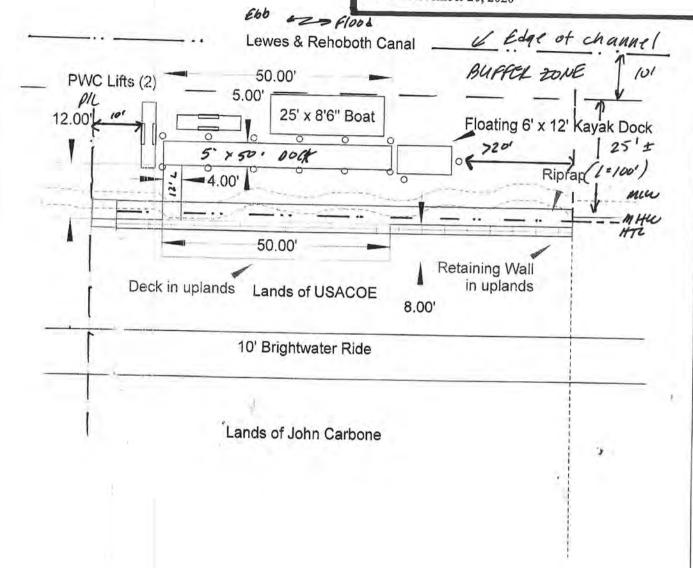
Plan view of proposed project (prepared by Precision Marine Construction, Inc.).
